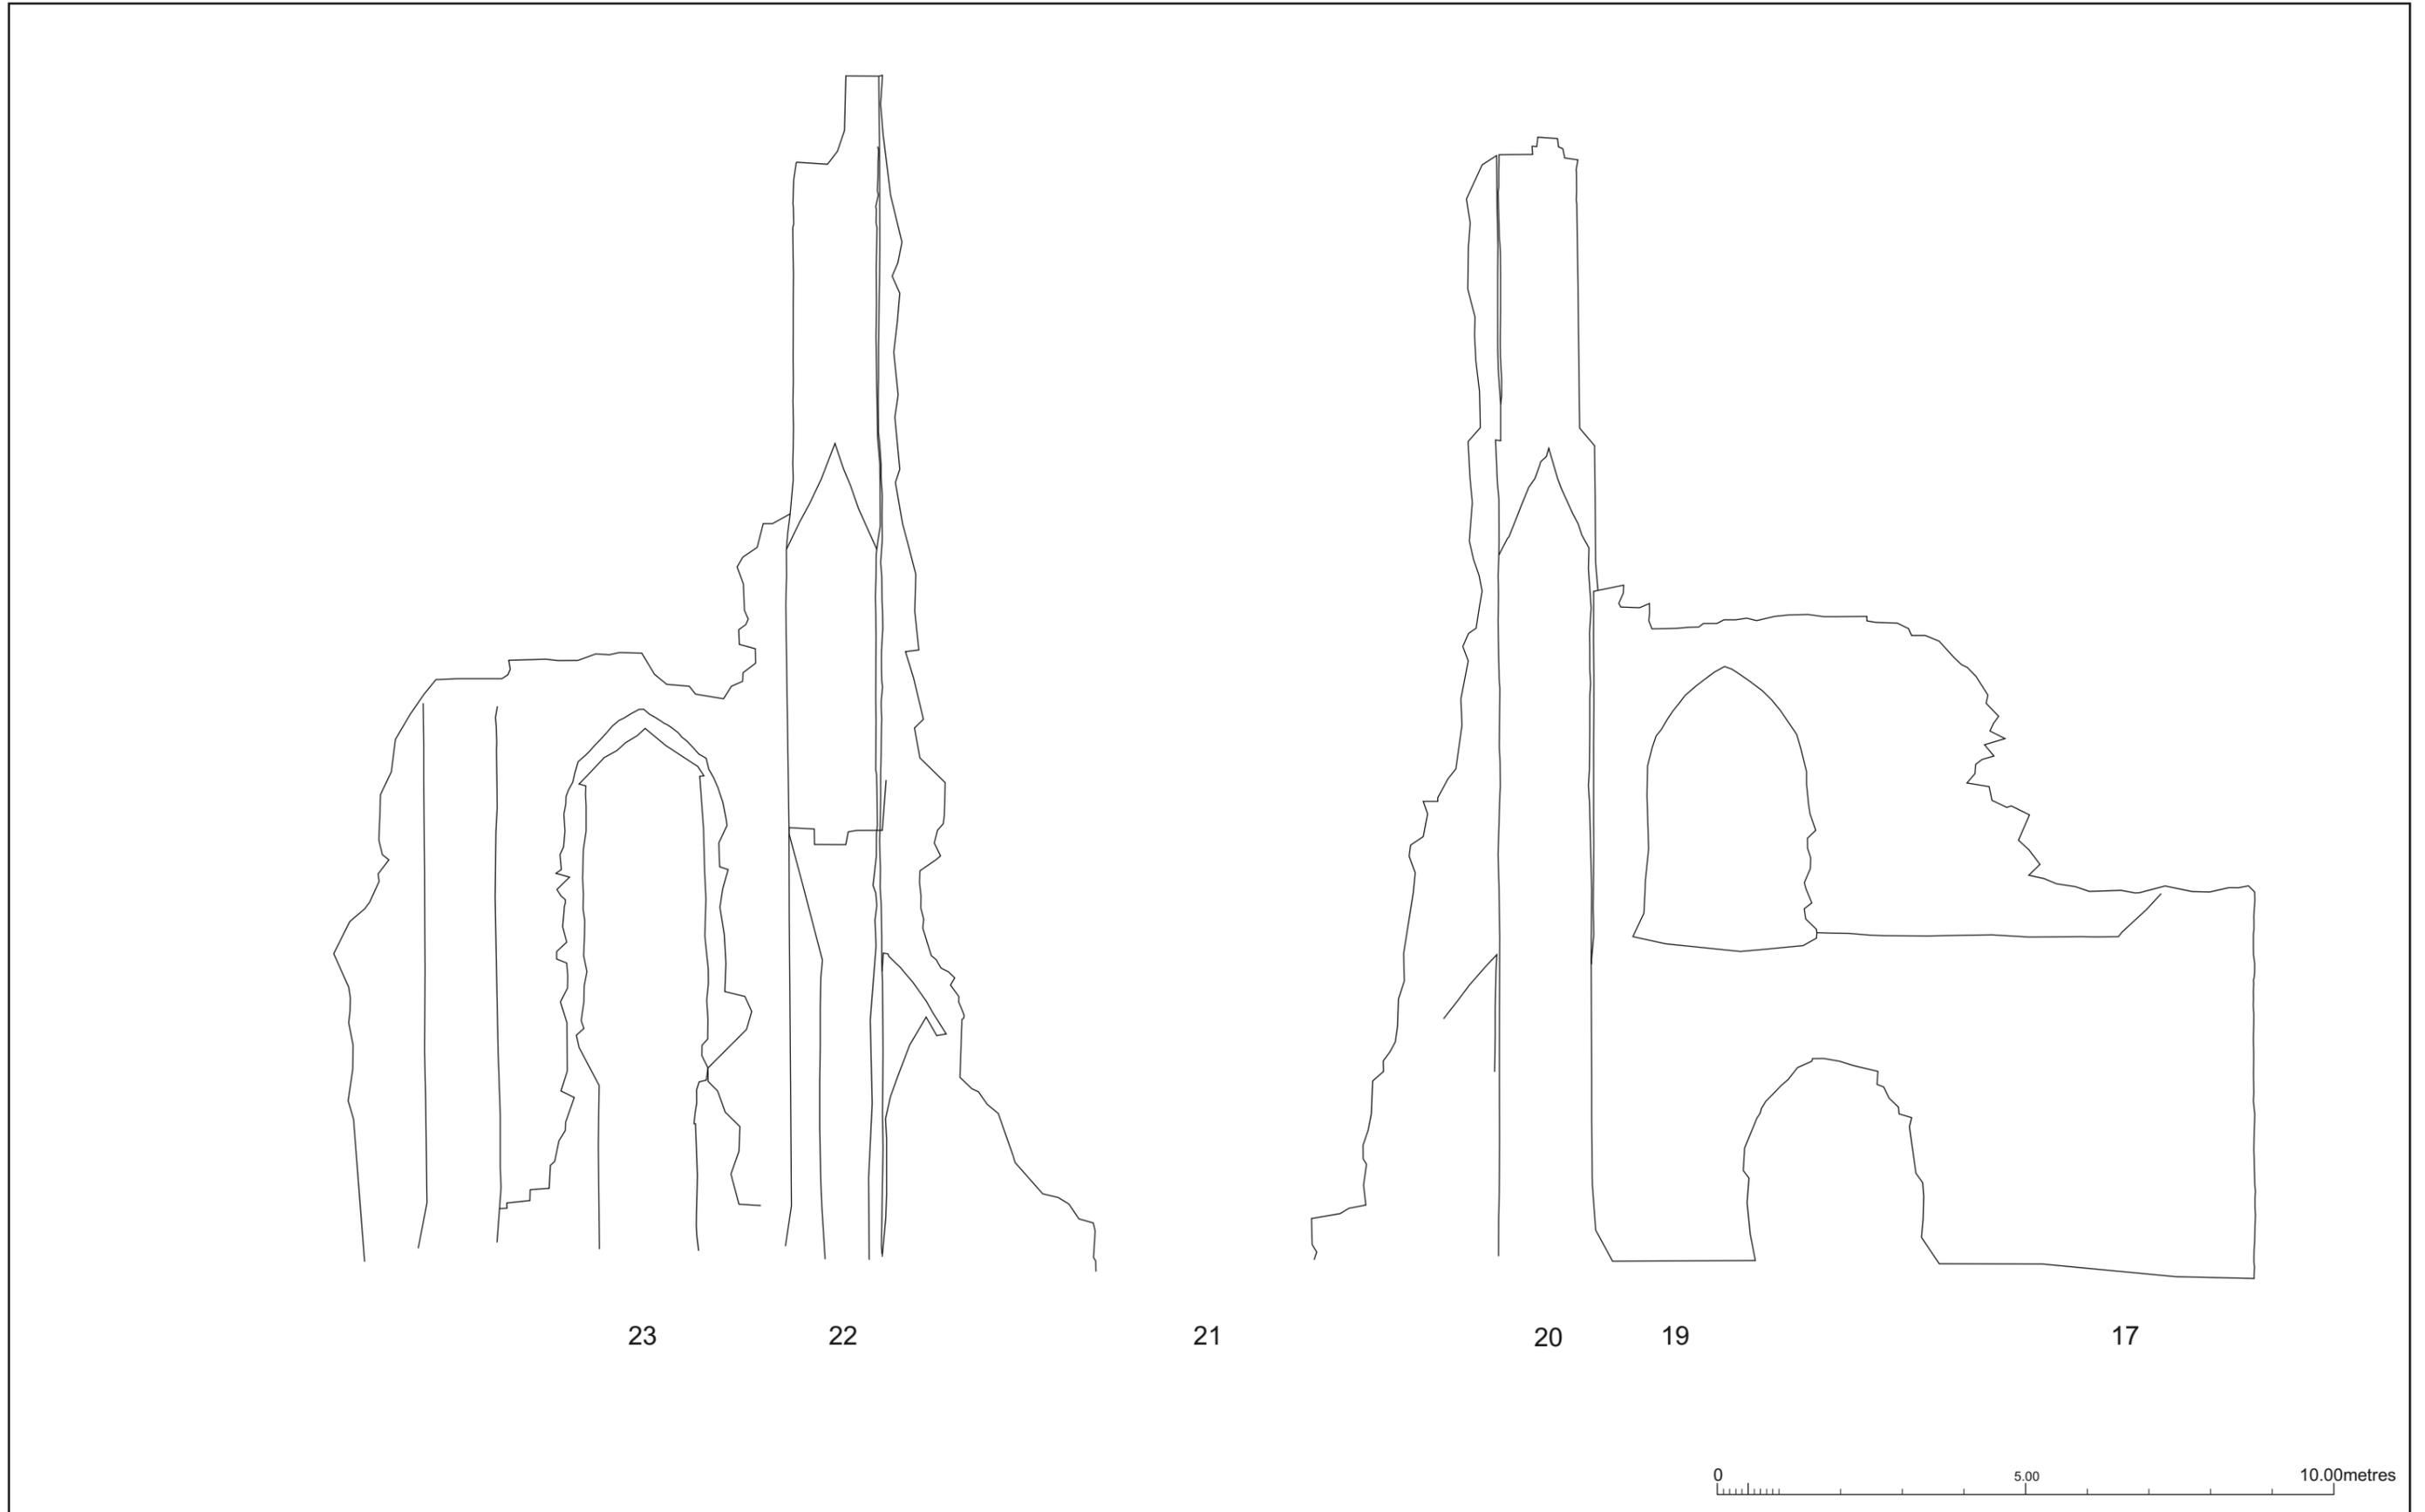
West facing elevation of walls 17, 19, 20, 21, 22 and 23
